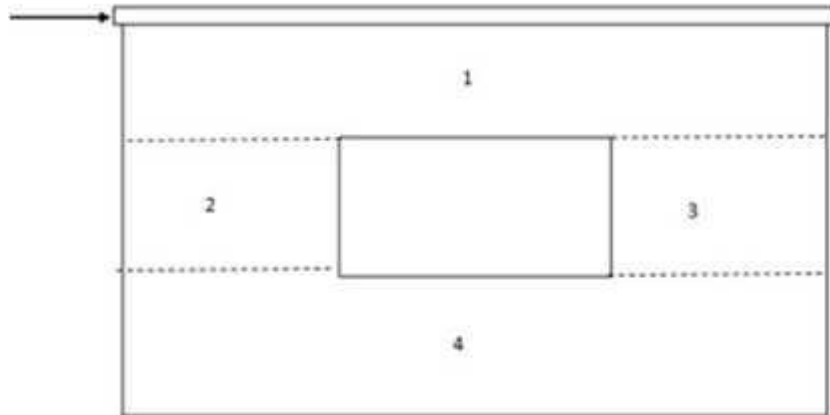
Schematic diagram showing different piers in a typical load bearing wall, for use in pier analysis method
